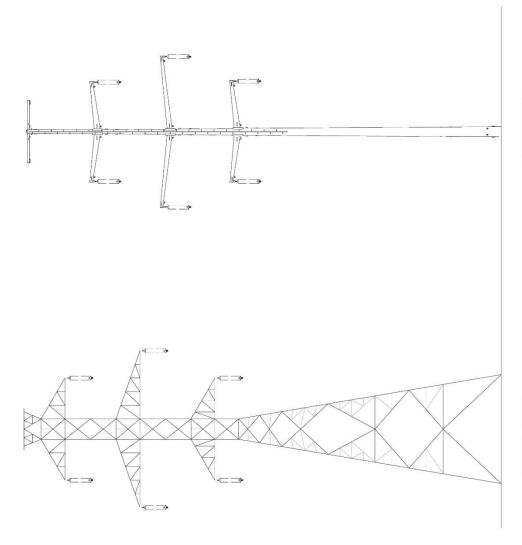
STEEL LATTICE TOWER AND STEEL MONOPOLE DESIGN
